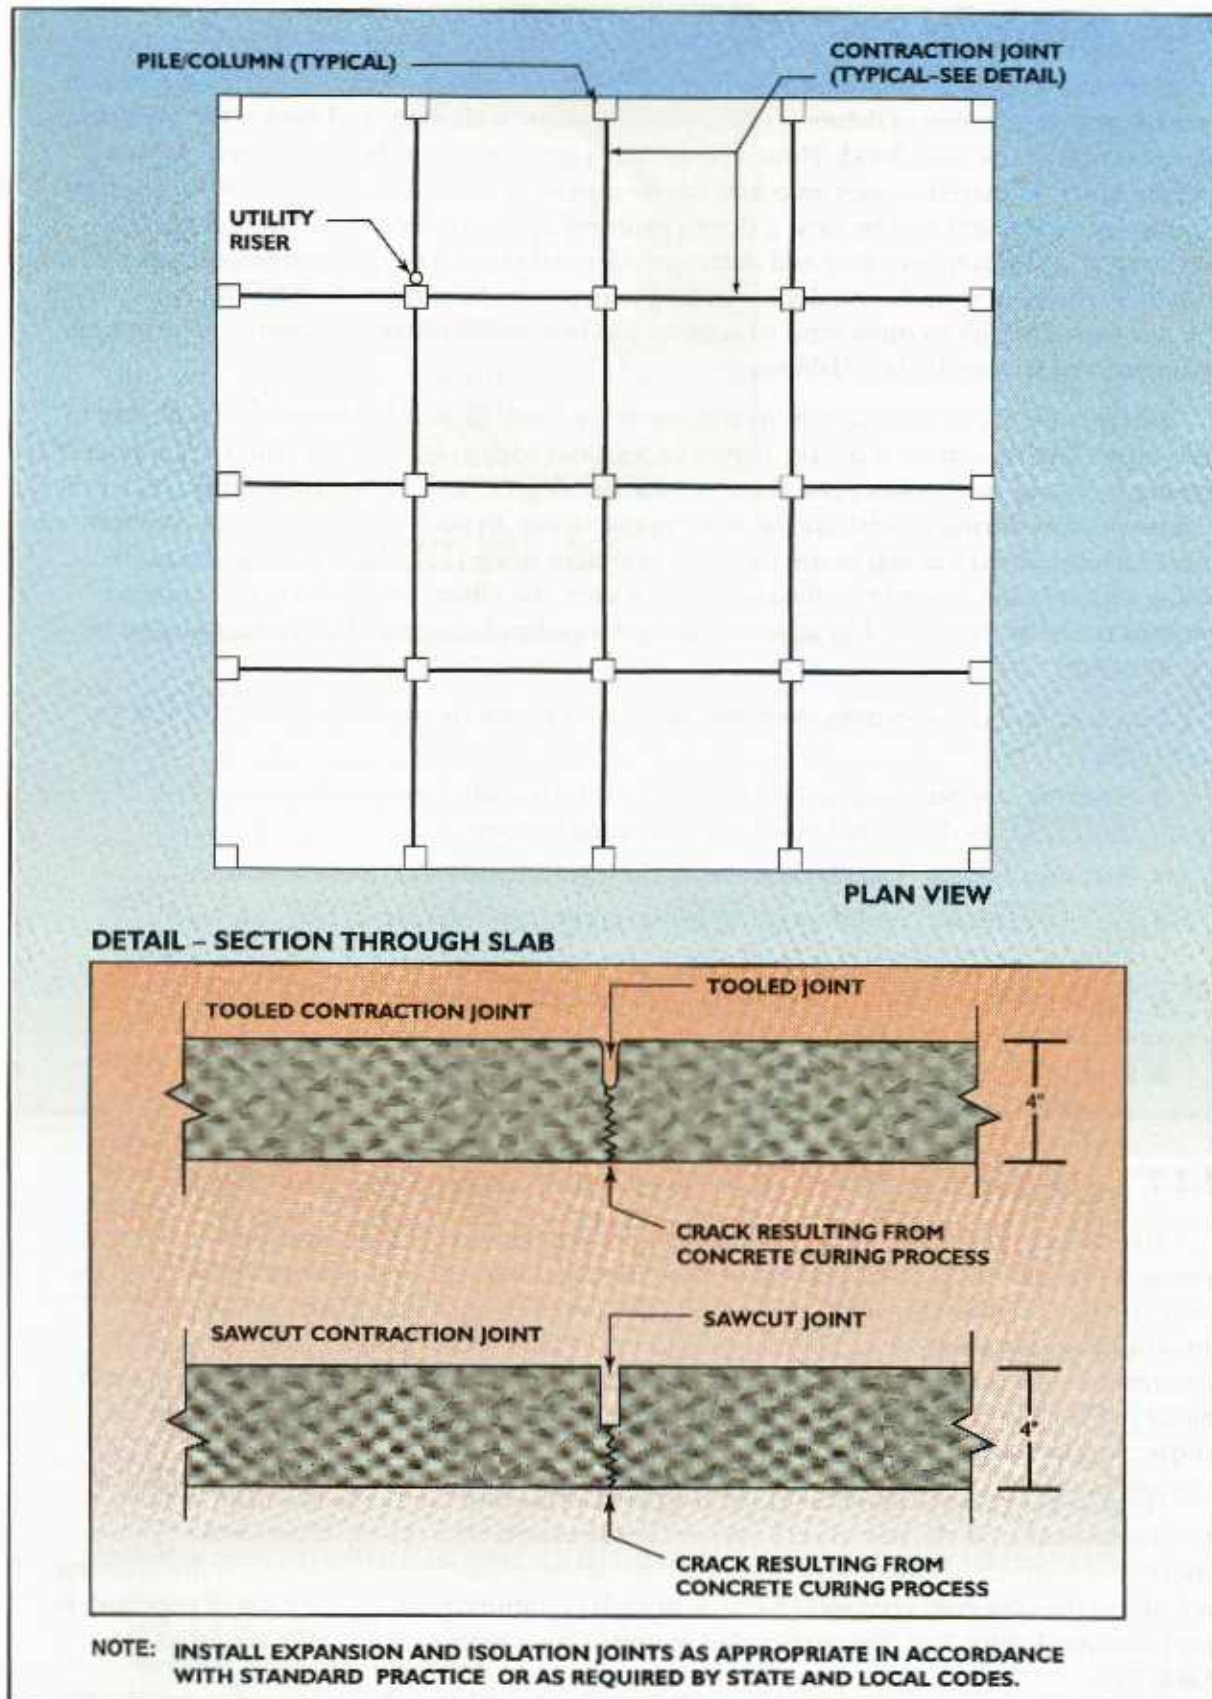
Recommended contraction joint layout for frangible slab-on-grade below elevated building.
